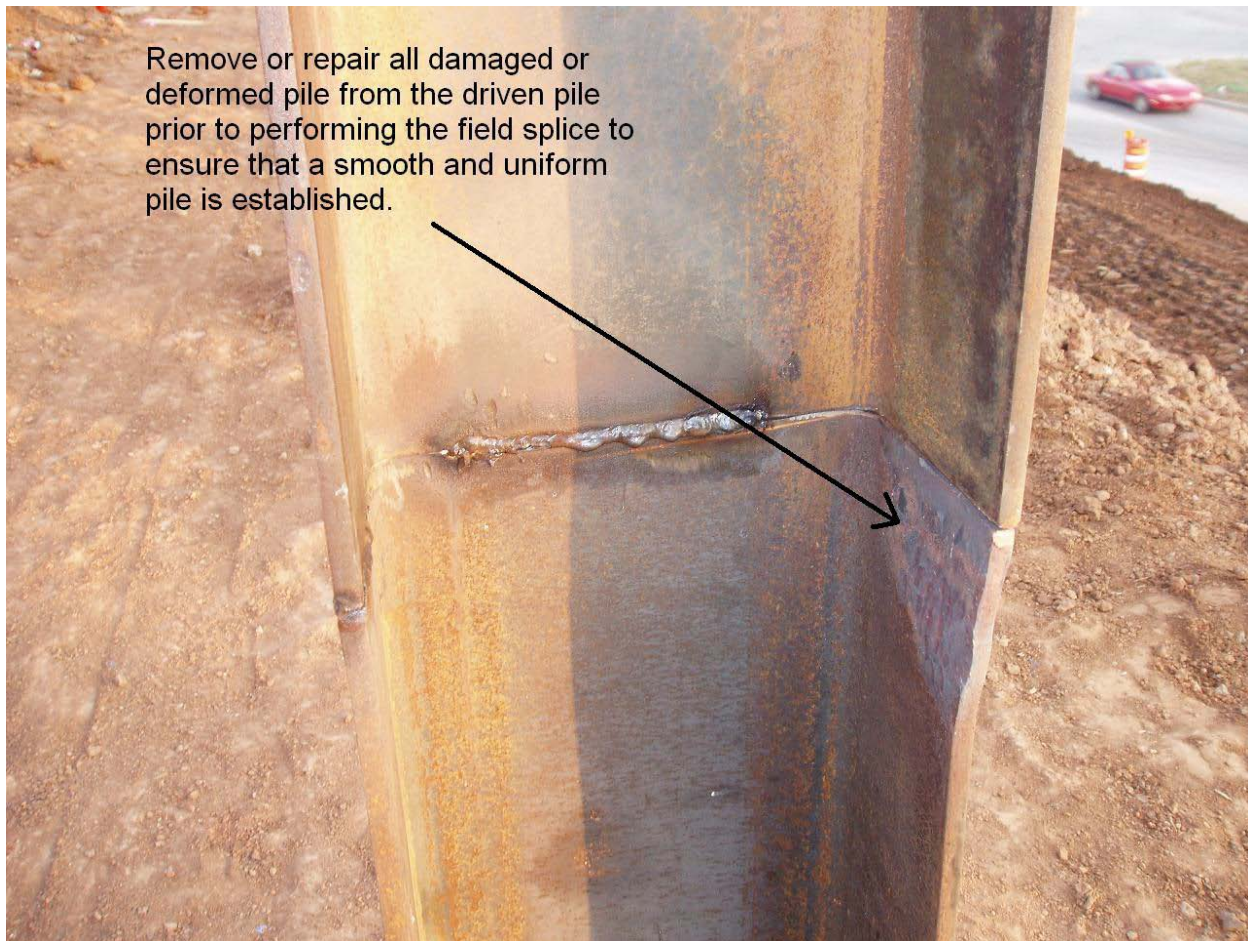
1. Photo. Need to Repair Damaged/Deformed Pile
